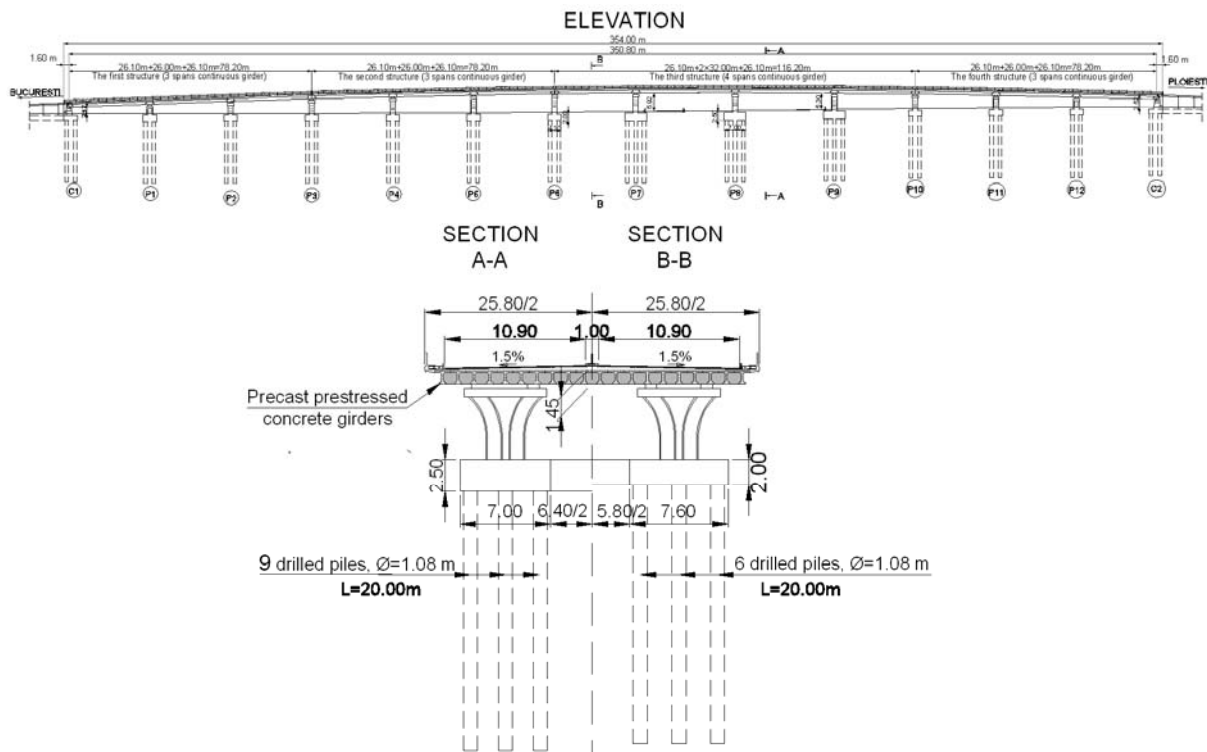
General layout of the analyzed bridge: elevation and cross sections
